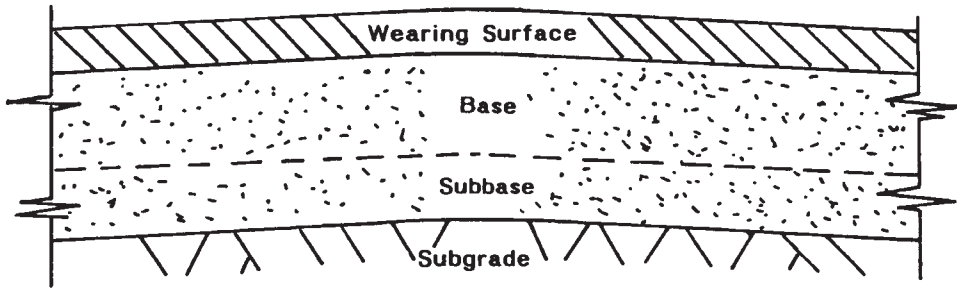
Simplified flexible pavement structure (Seelye, 1945).
